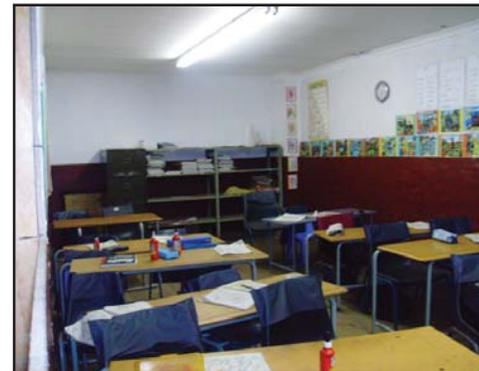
Drywall partitioning is used to sub-divide the warehouse into classroom spaces (minimum natural lighting and ventilation)
